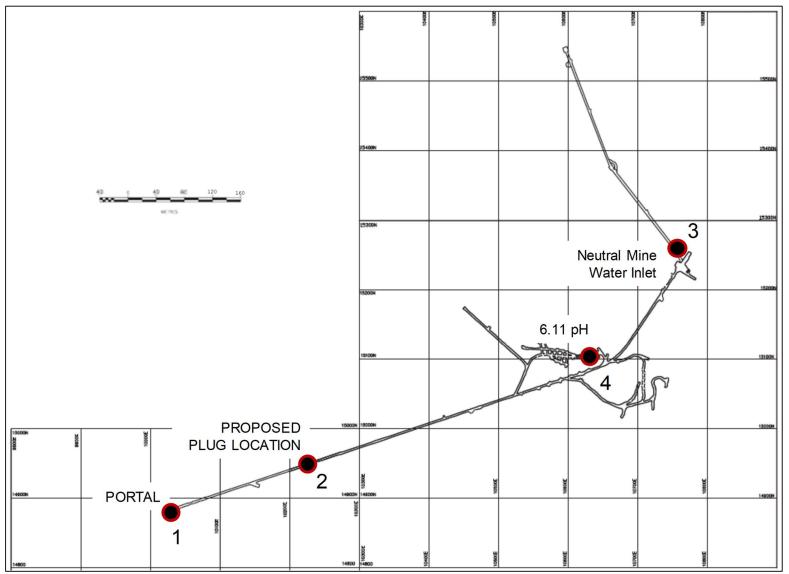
5400 Level Underground Workings with Proposed Inspection Locations
